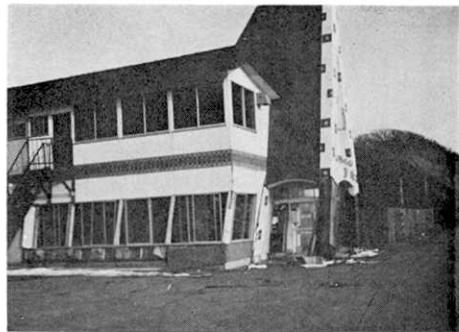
Damaged Drive-in restaurant "Abe" in Mitsuishi town.
